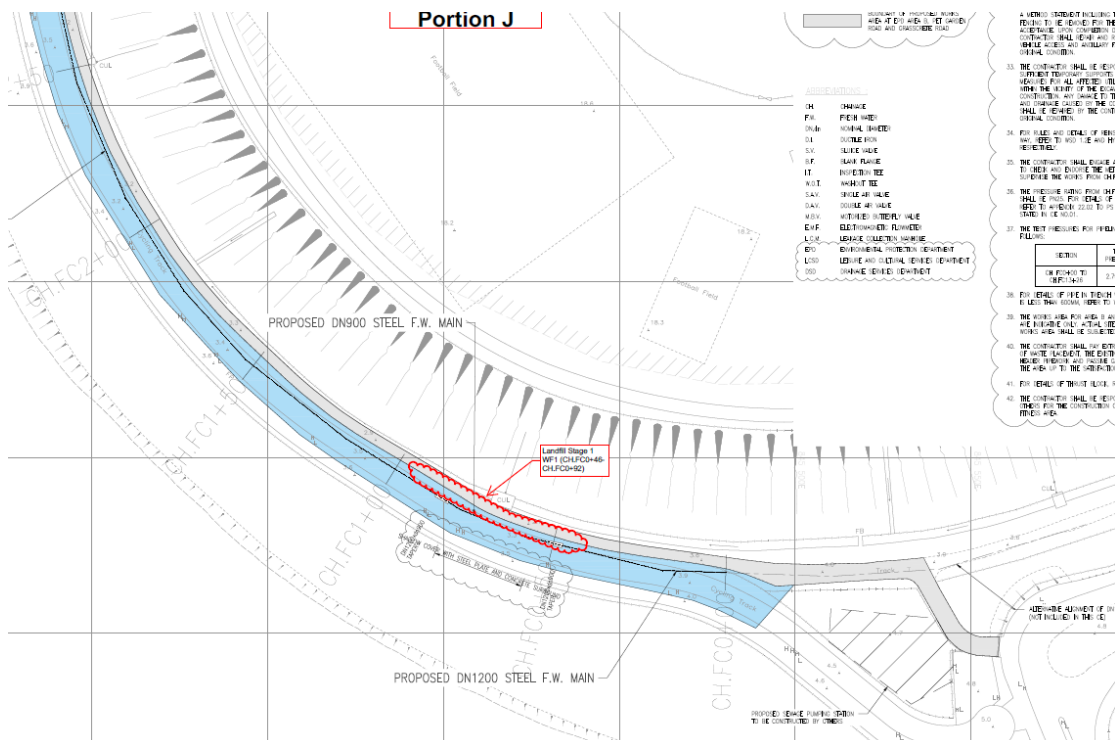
Location Plan – Landfill Stage 1 (Area FC0+42 -FC0+92)
